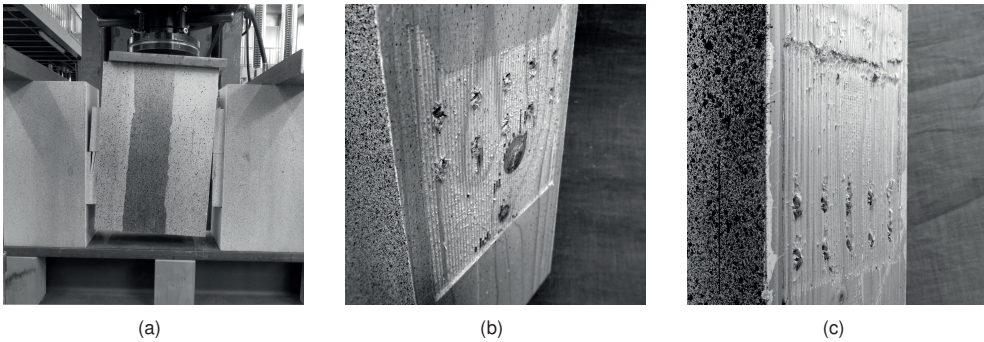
Specimens with prototype v1 after tests: (a) tensile screw failure at right top plate; (b) impression of bottom plate; (c) impression of top plate.
